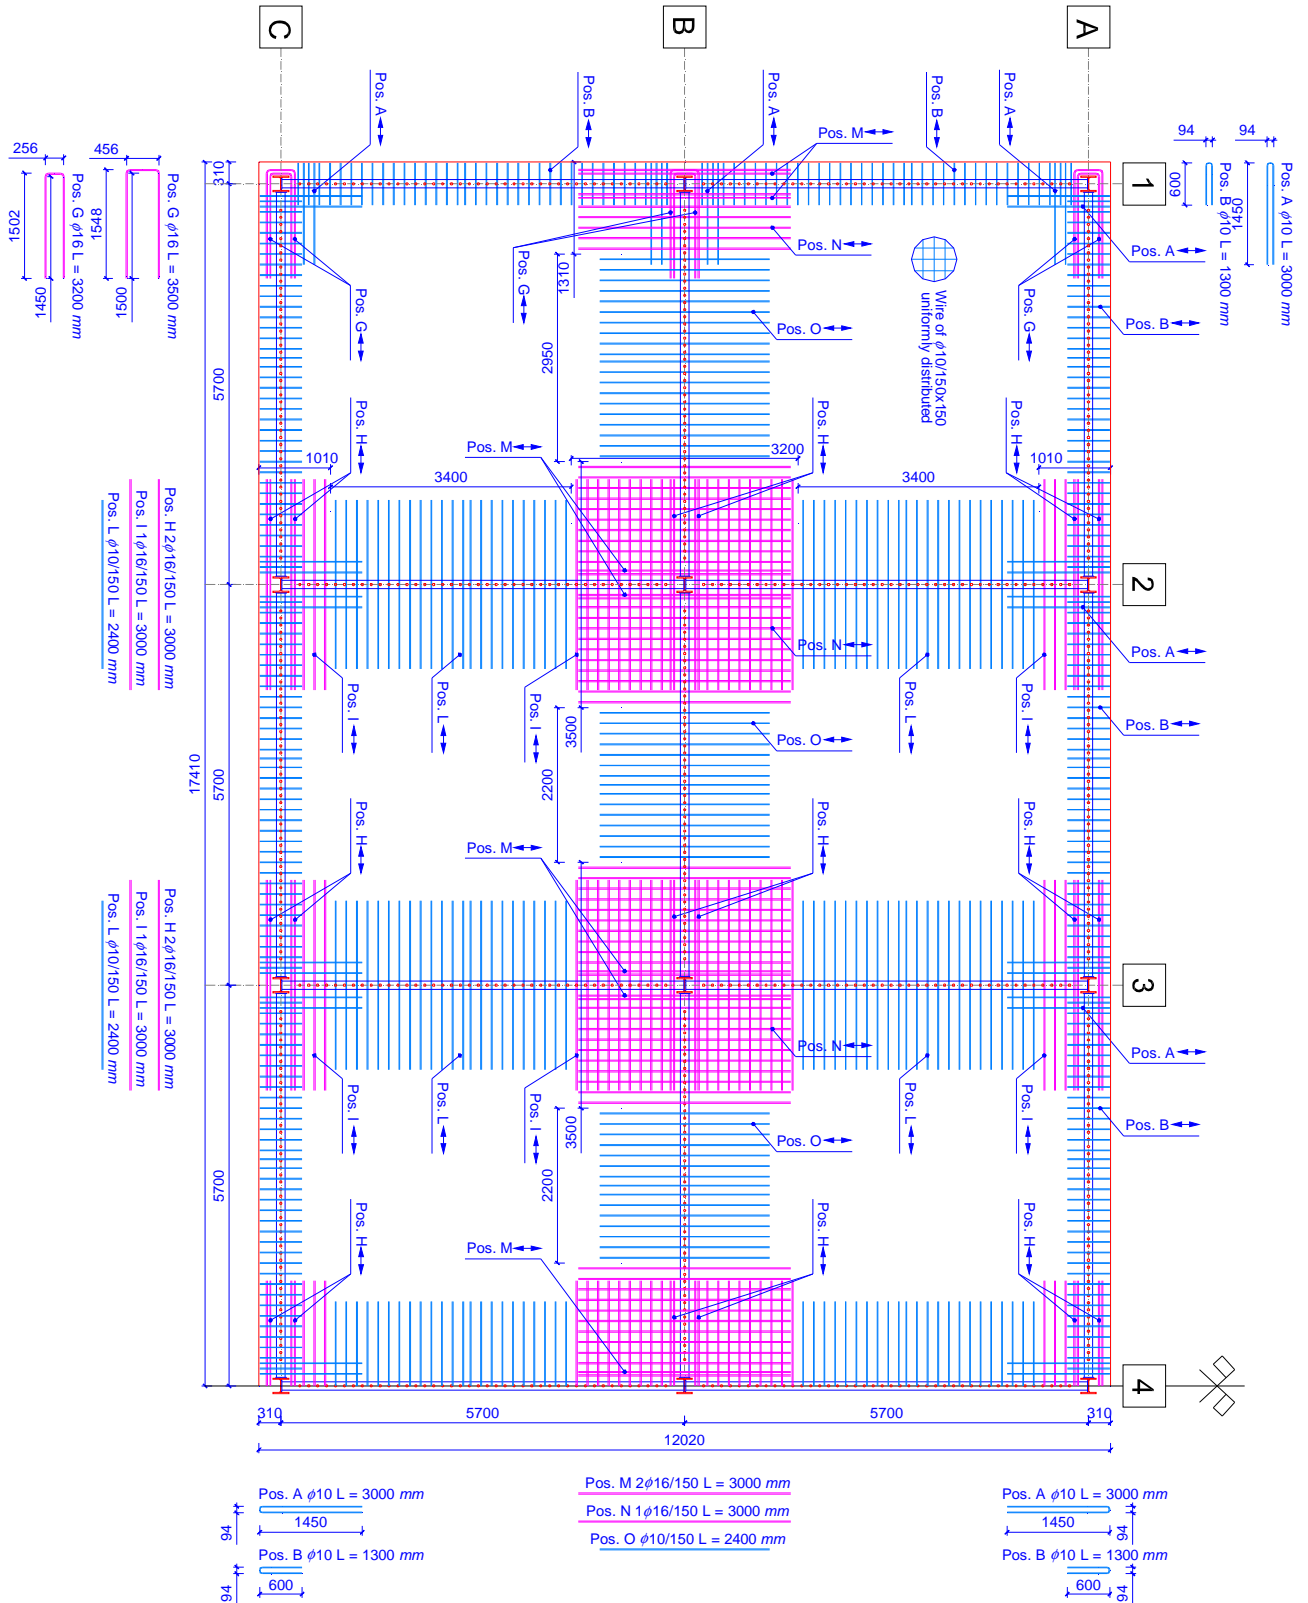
Slab Rebars - Upper Side – Symmetric Configuration (length unit mm)
